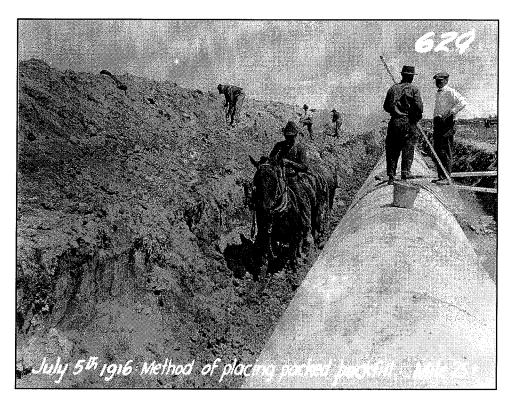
Compacting backfill beside the lower extremity of the arch leg. (Construction Photograph No. 629)
